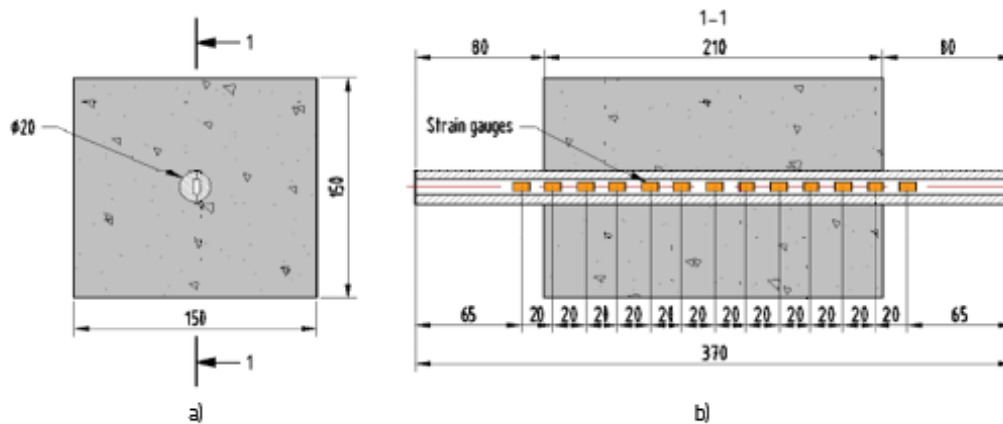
Installation and spacing of strain gauges a) cross-sectional view and b) longitudinal layout
